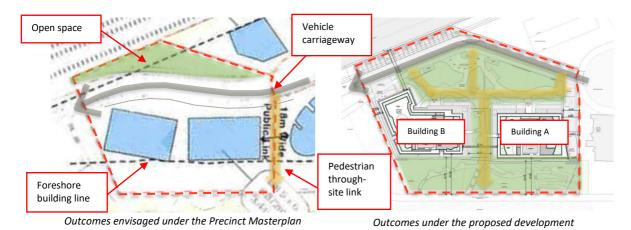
Extract of Section 4.3 Preferred Concept – Plan of Shepherd Street Precinct masterplan (left) and proposed site plan (Mosca Pserras architects) (annotations by SJB)
